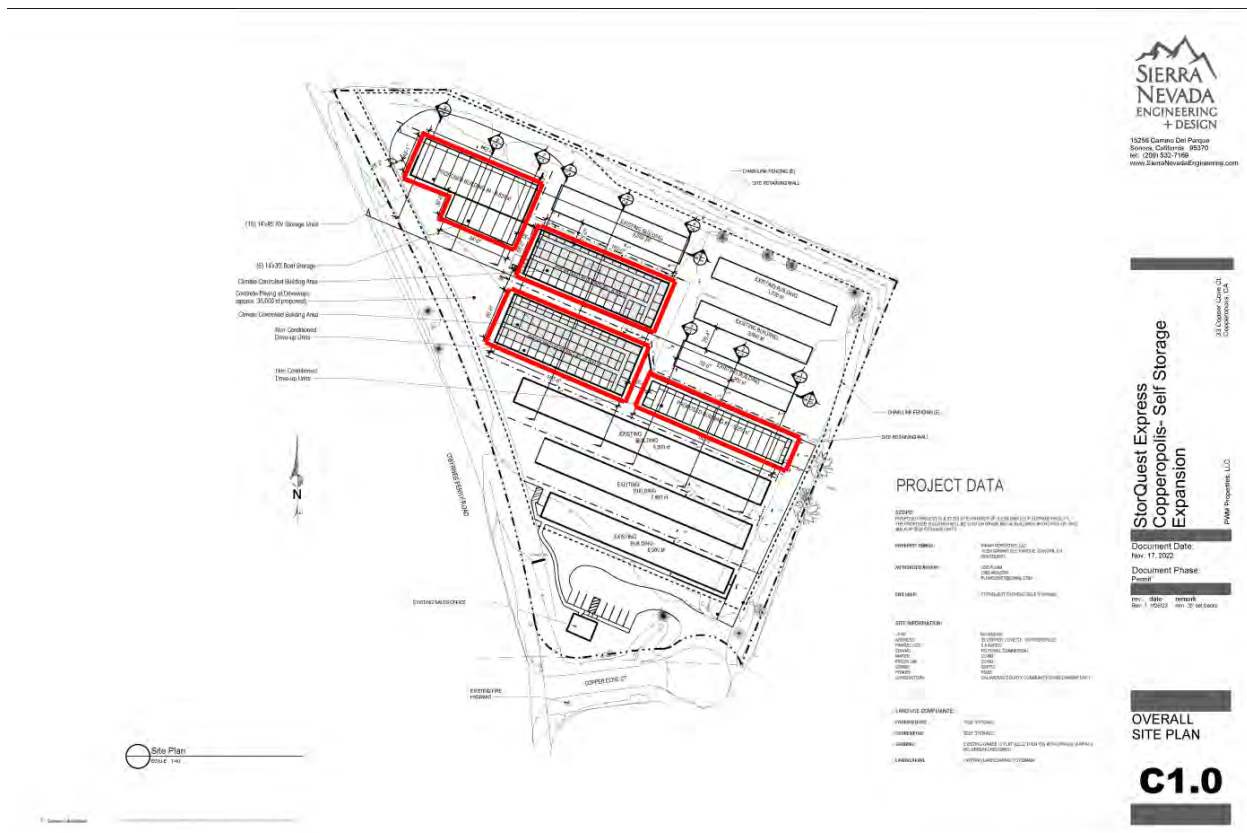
Proposed Site Plan (Expansion outlined in red)
